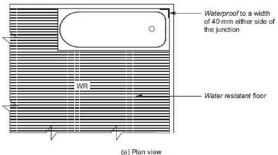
Areas adjacent to baths and spas without showers for concrete, compressed fibre-cement and fibre-cement sheet flooring
